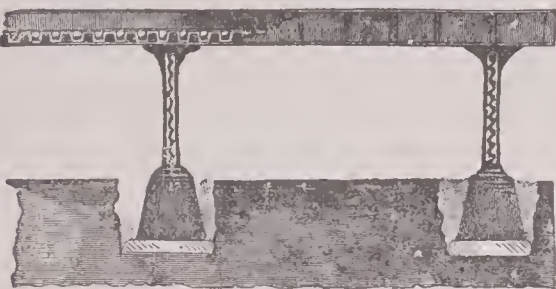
CONSTRUCTION OF AN ELEVATED RAILWAY.
